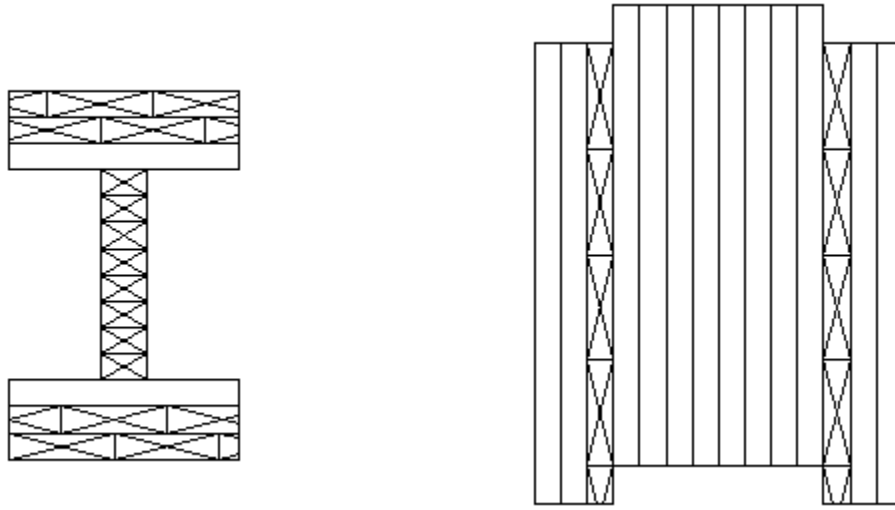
Test #2 – Glue Bond with MF in Rolling Shear Configuration
